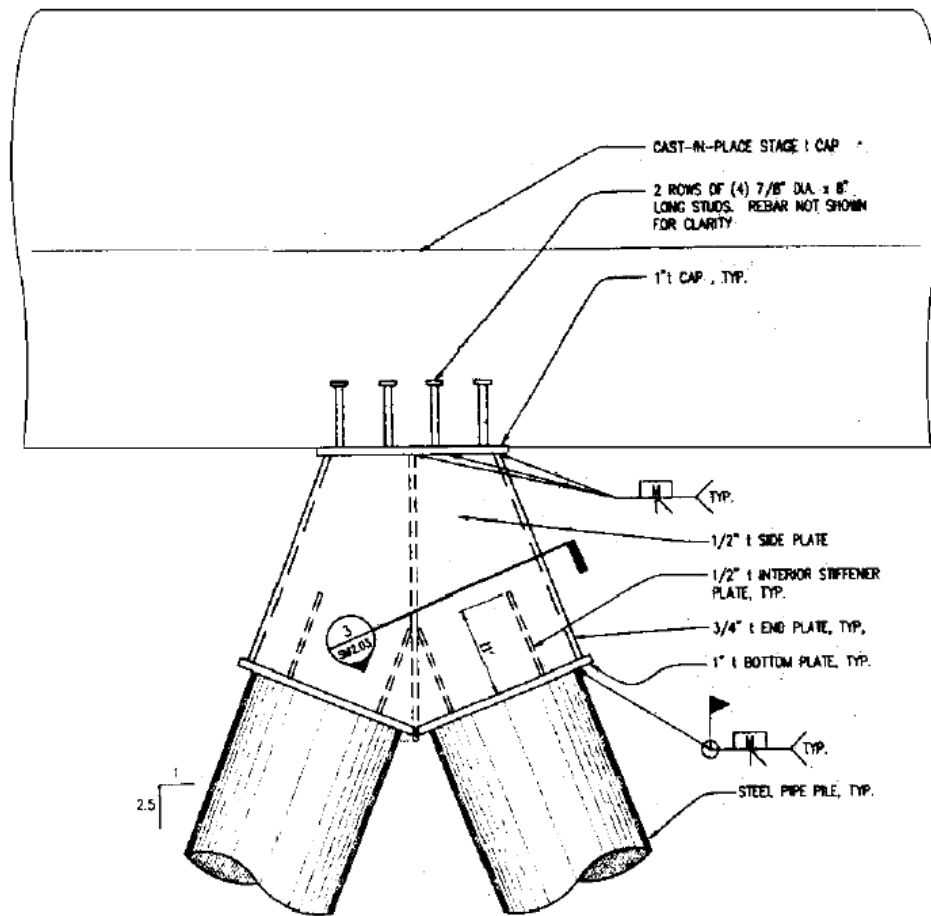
Alternative steel pile connections of a pipe-section pile with high inclination (Roder, 2002)
